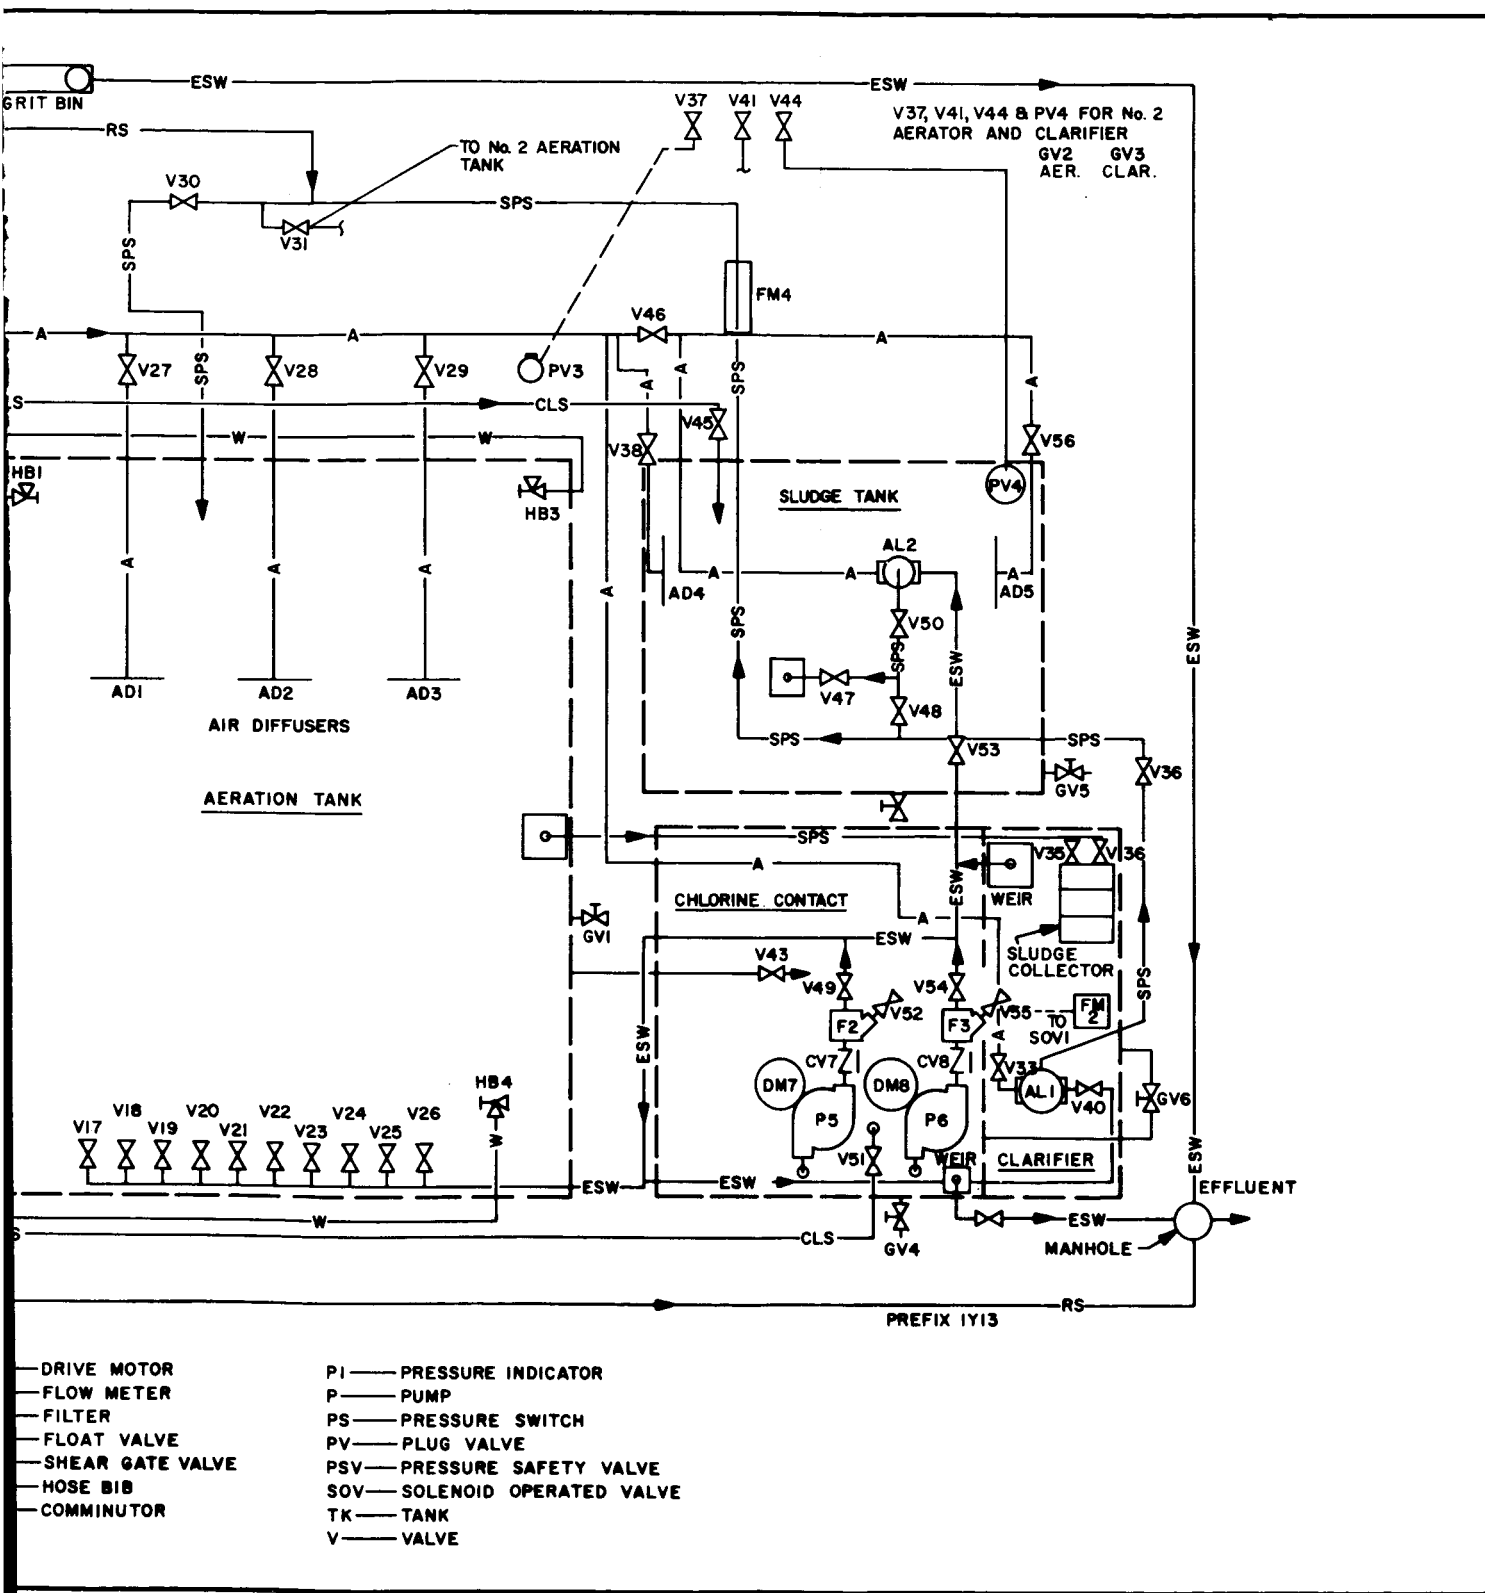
Water Treatment System - Plant No. 4 Building K6-792
